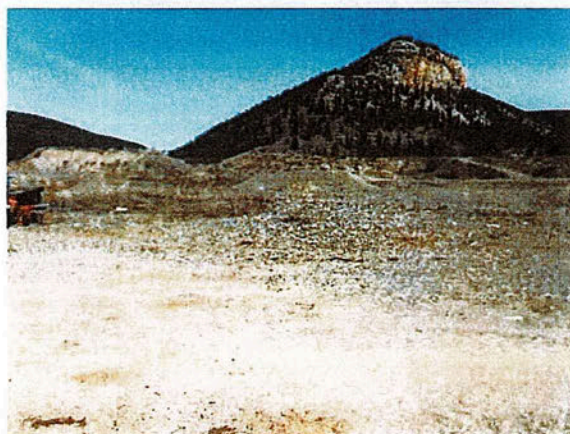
A photo of the proposed Gravel Extraction Area from the South boundary looking North.
